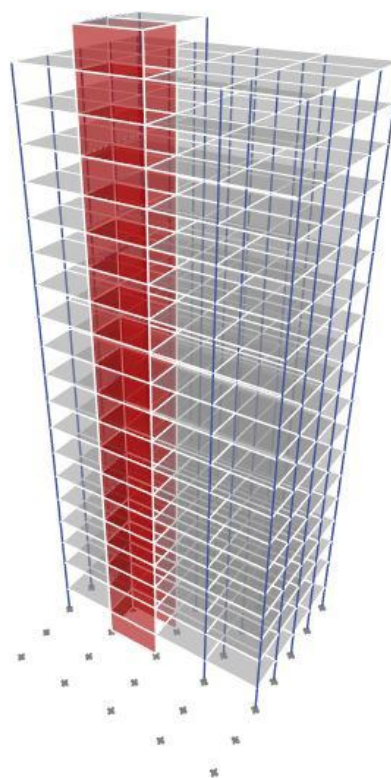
3D Sectional View of Structure with basic Base Shear Reduction Techniques
